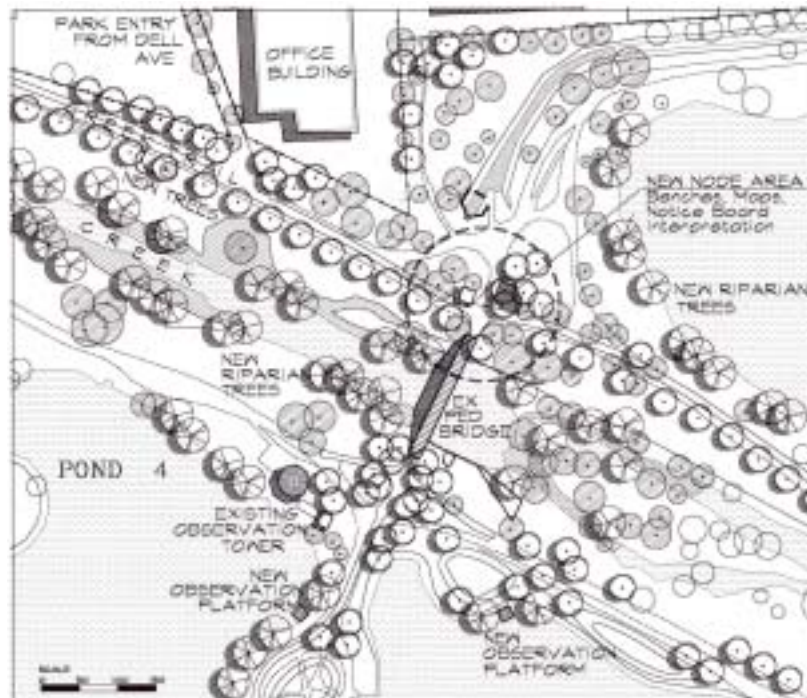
Detail Plan — Zone 3 Node Point at Pedestrian Bridge
